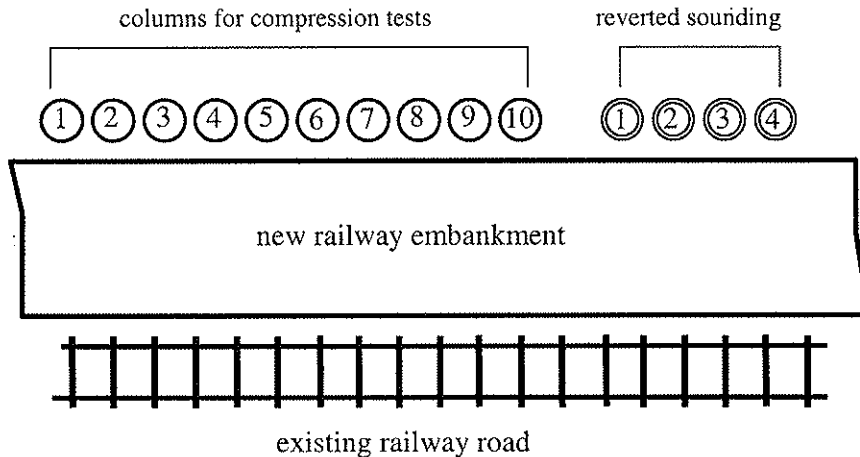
Plane of installation of lime/cement columns at the Varberg site.
